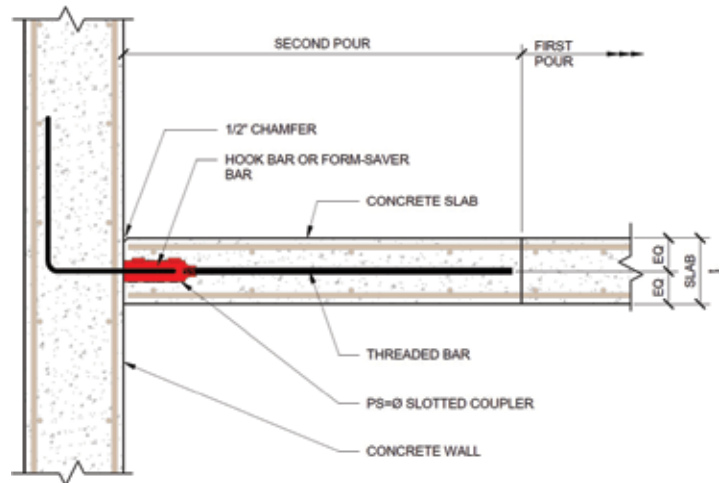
PS=Ø slab-to-wall restraint relief joint with temporary stressing strip
